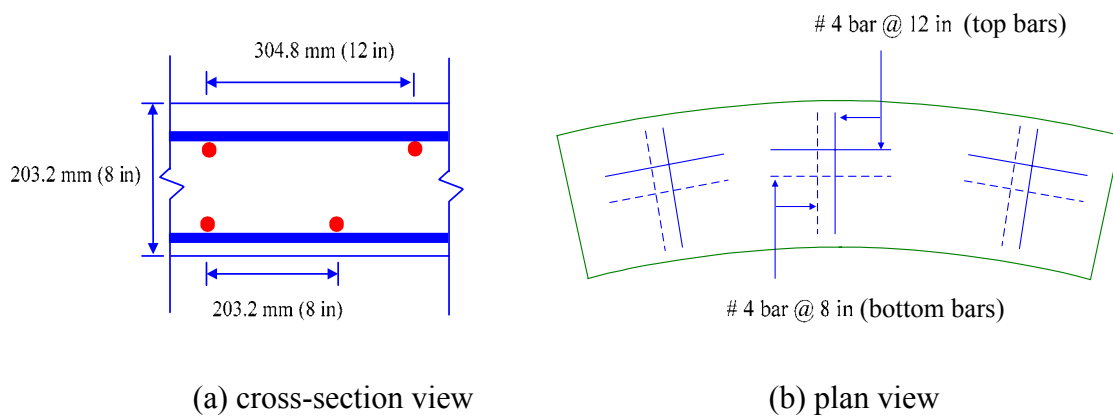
Reinforcement schedule in the bridge slab.
